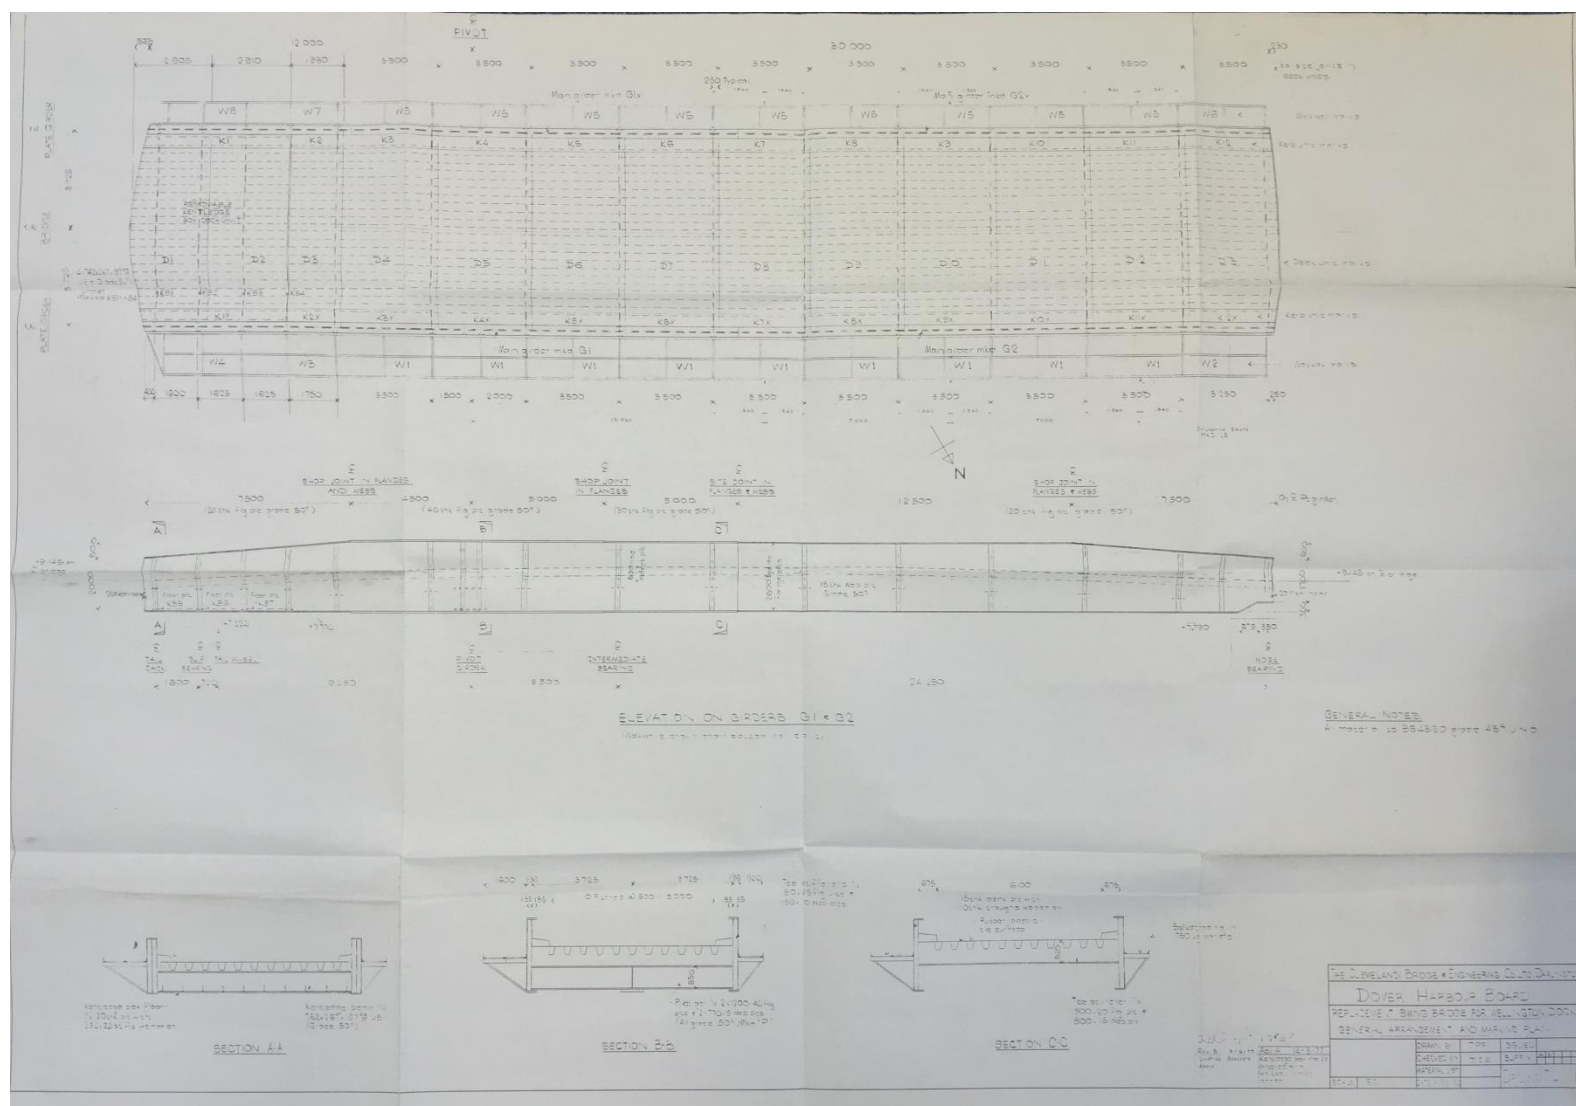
Replacement Swing Bridge for Wellington Dock, General Arrangement and Marking Plan, Dated circa. 1977, DHB Historical Drawing Archie
